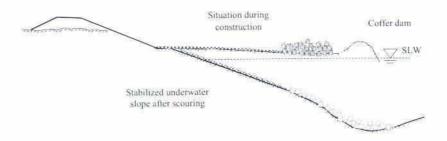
Initial situation after construction and assumed profile development due to scouring in front of the revertment (sketch)
